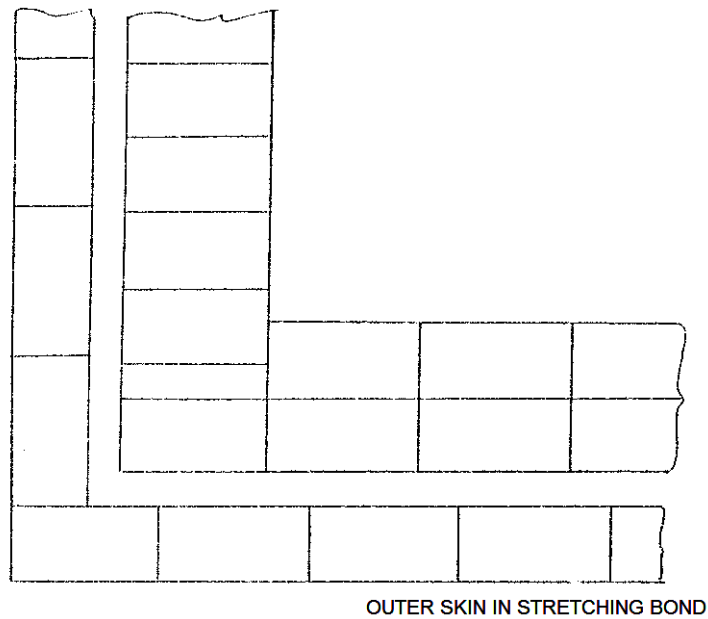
(a) Alternate plan courses for 395 mm cavity wall – outer skin
